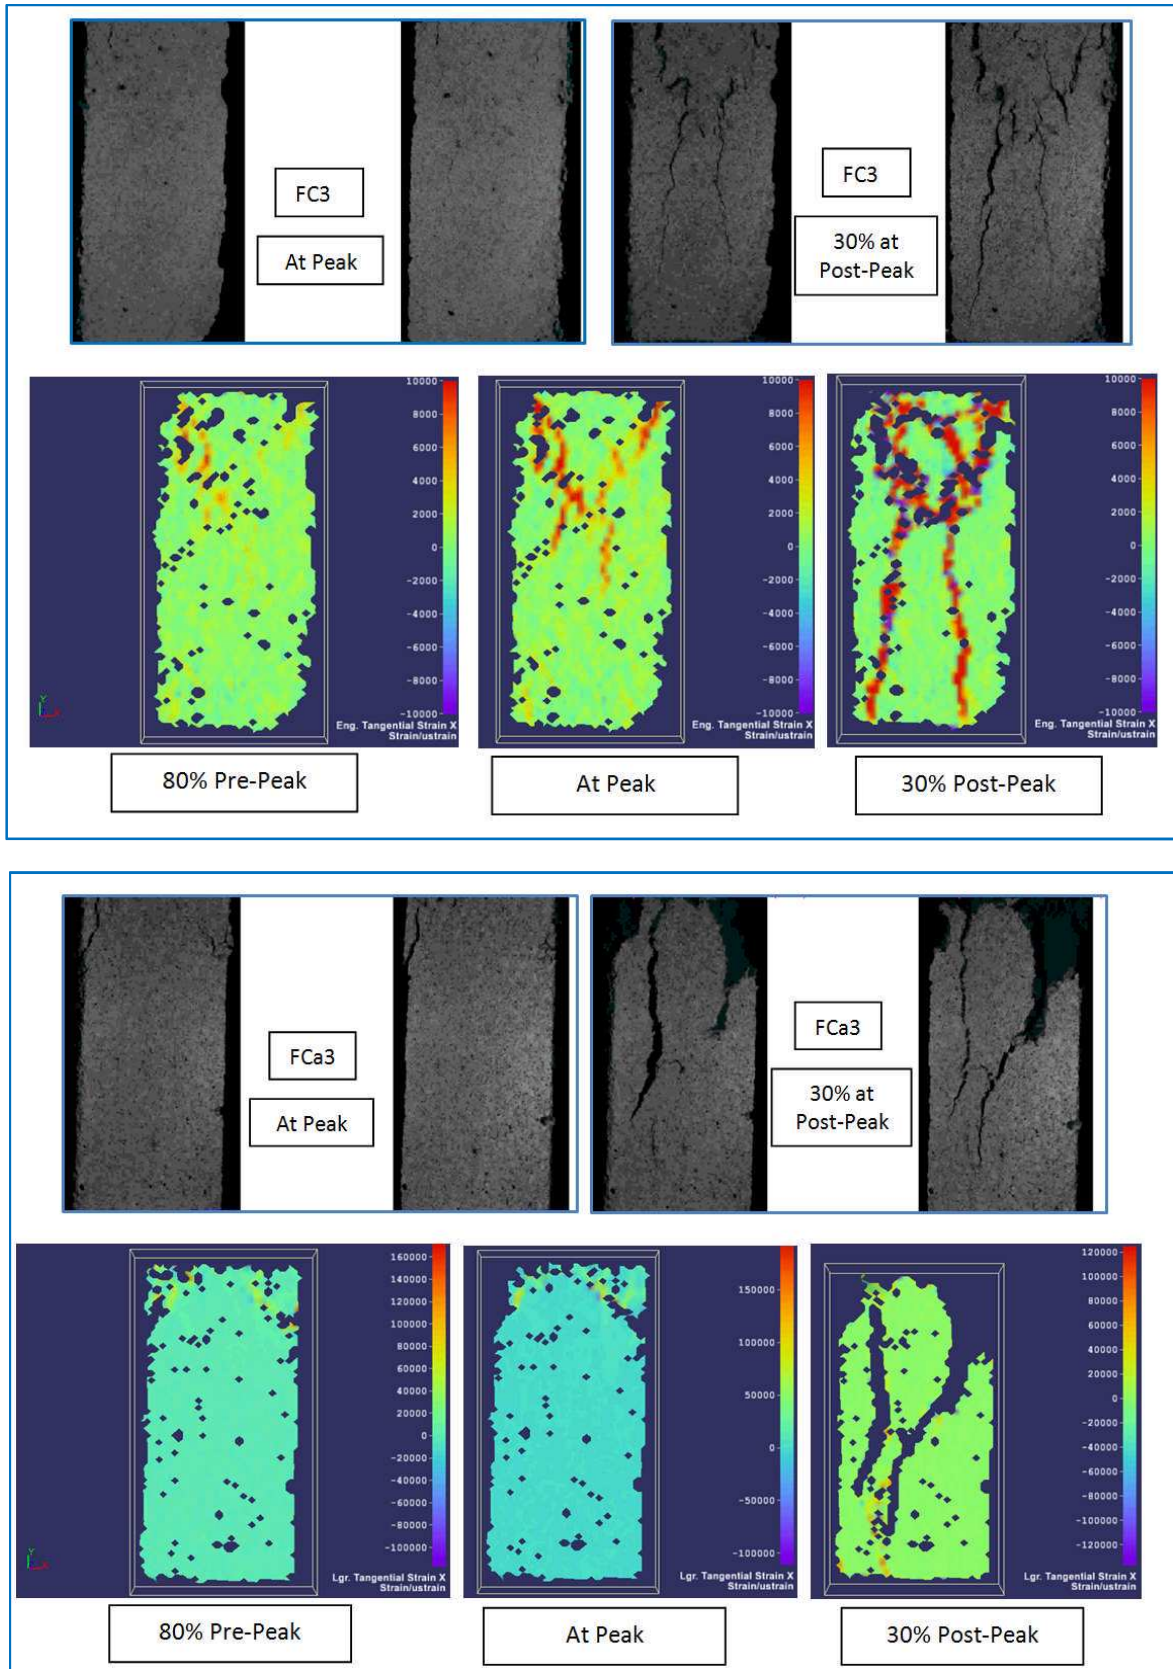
Cracks in selected foamed concrete specimens at different loading stages
